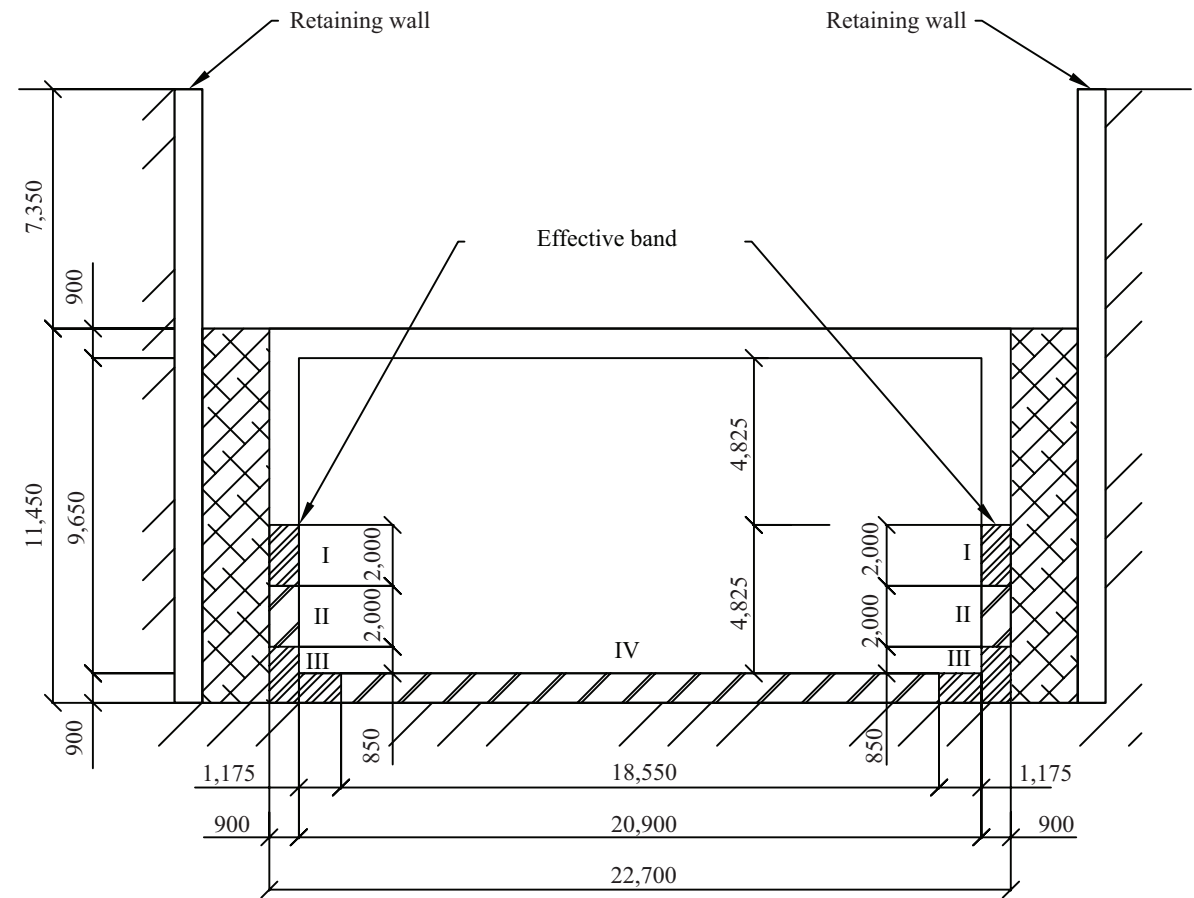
Cross-section of a characteristic underground station performed by open-cut method without backfill
